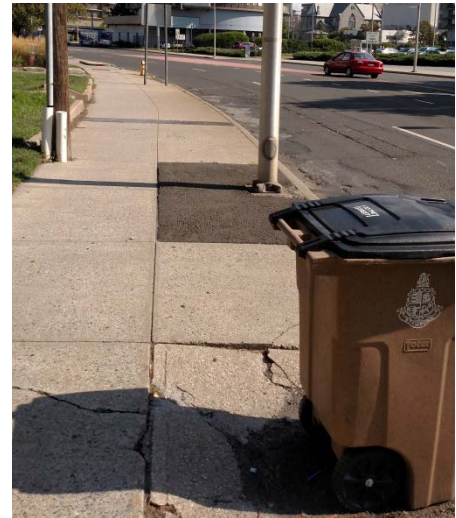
Sidewalk Narrows and Begins to Crack
